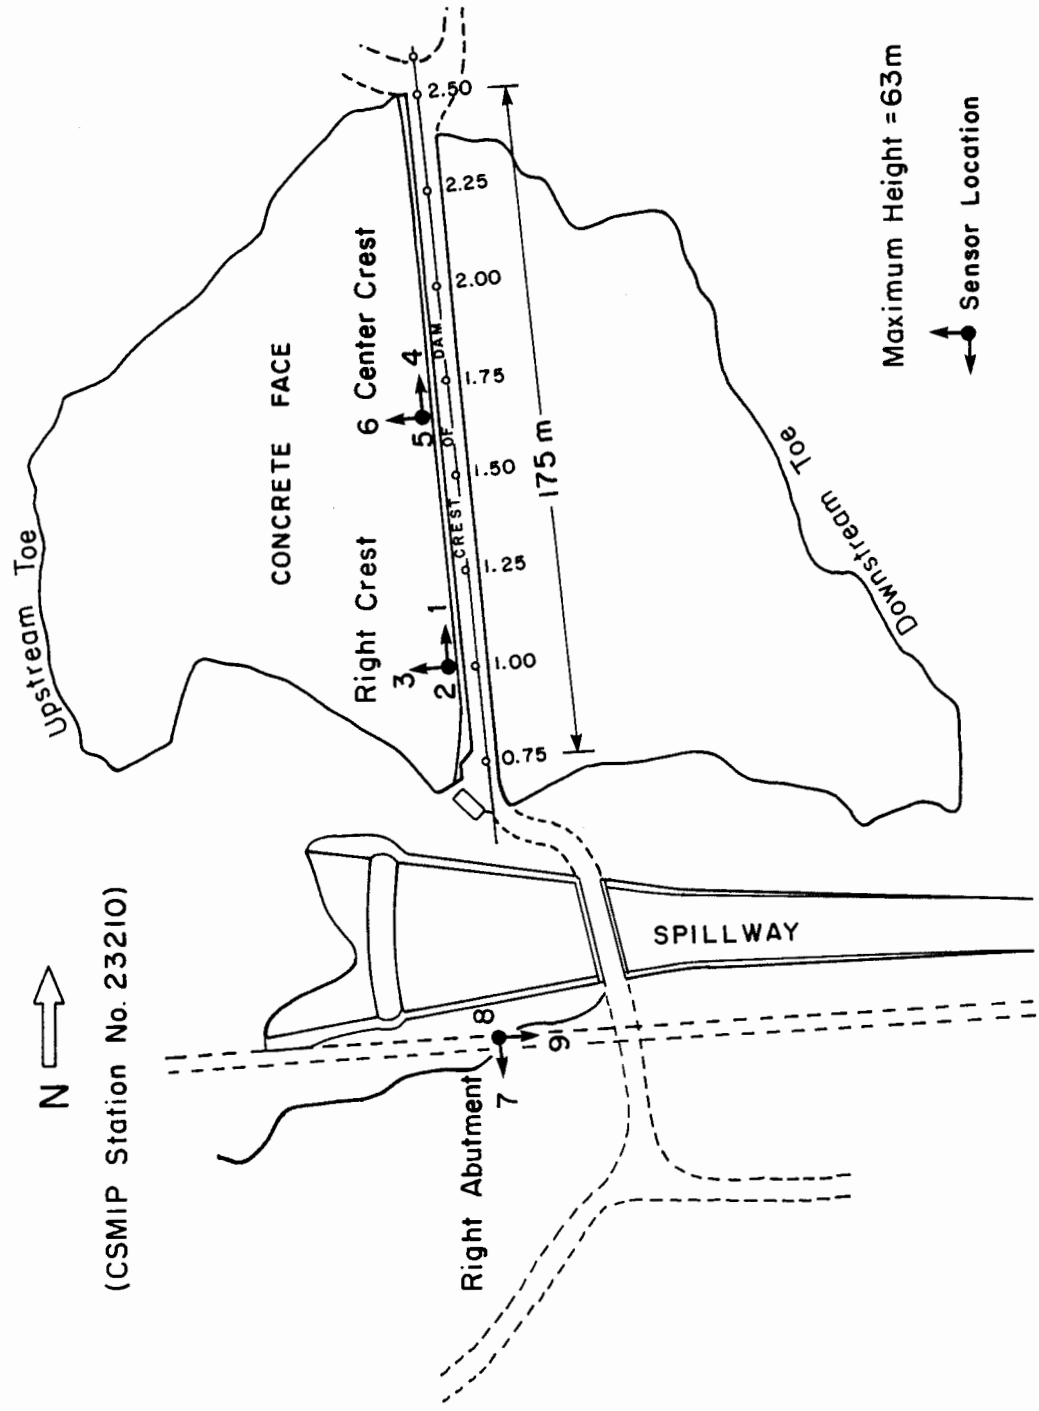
PLAN VIEW OF COGSWELL DAM SHOWING INSTRUMENT LOCATIONS
